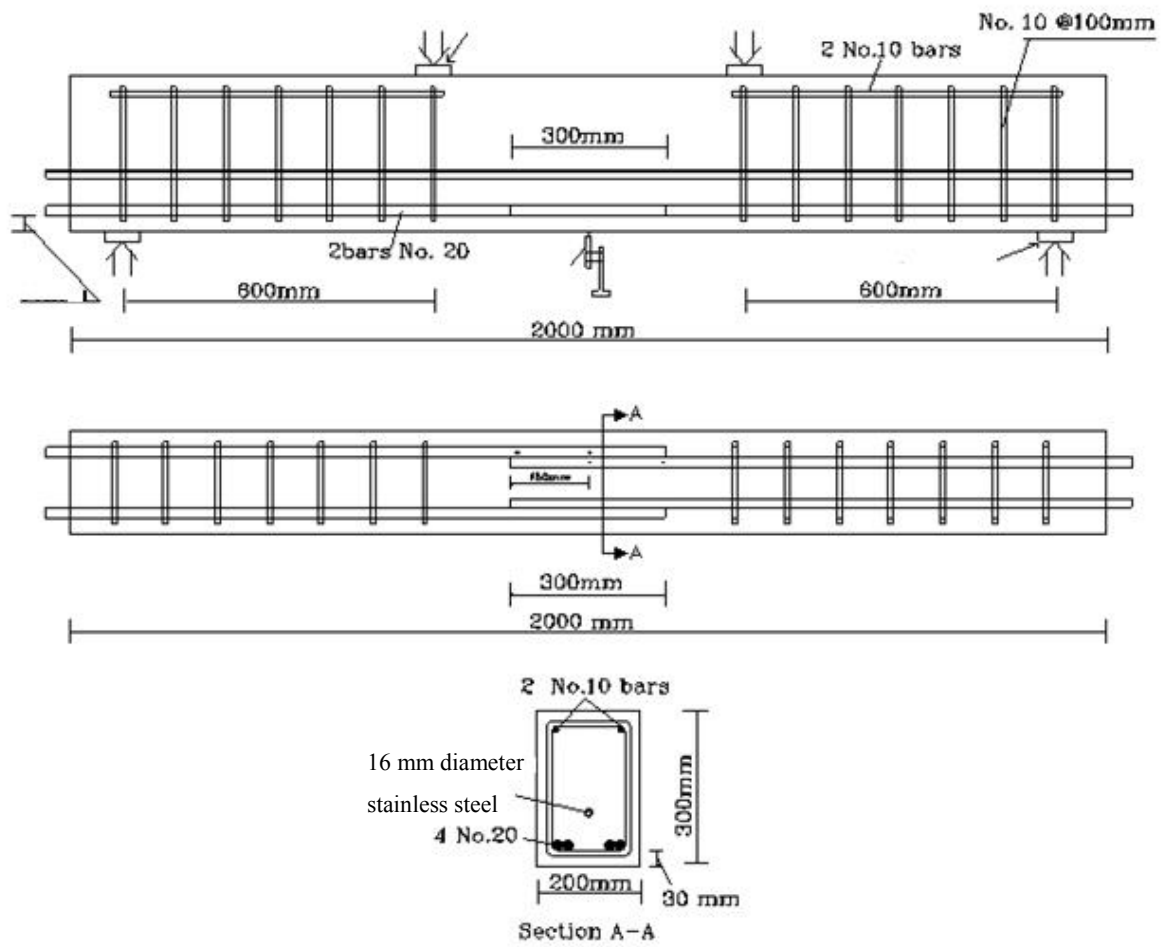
Beam configuration and reinforcement details ( $c/d = 1.5$ )
